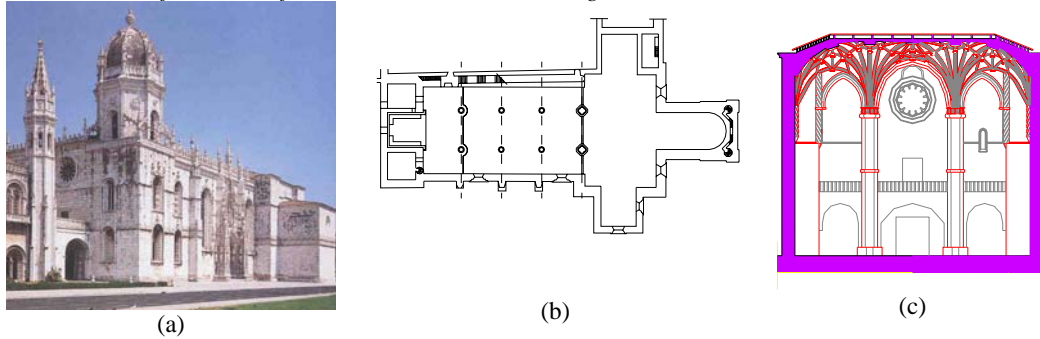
Geometry: (a) photo; (b) plan; (c) cross-section.
